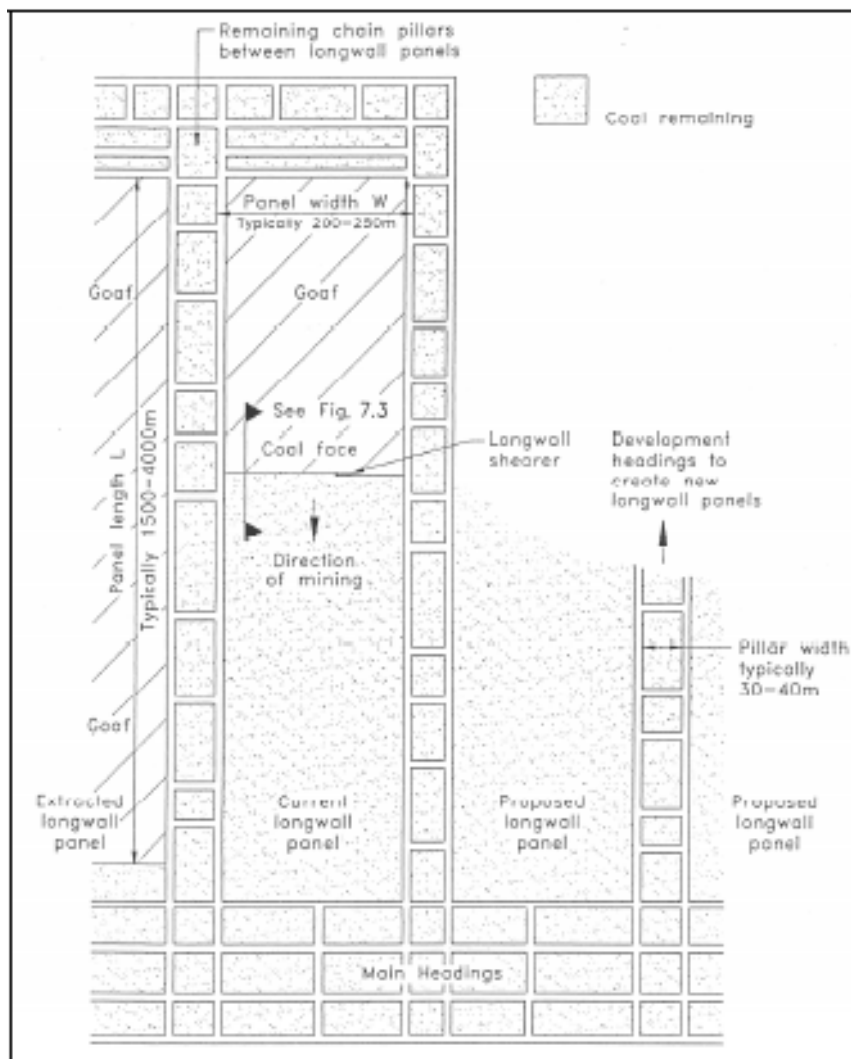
Explanation of longwall layout and terminology (Russell et al., 2010, Fig 27, p.31). Copyright NSW Government. With permission.
